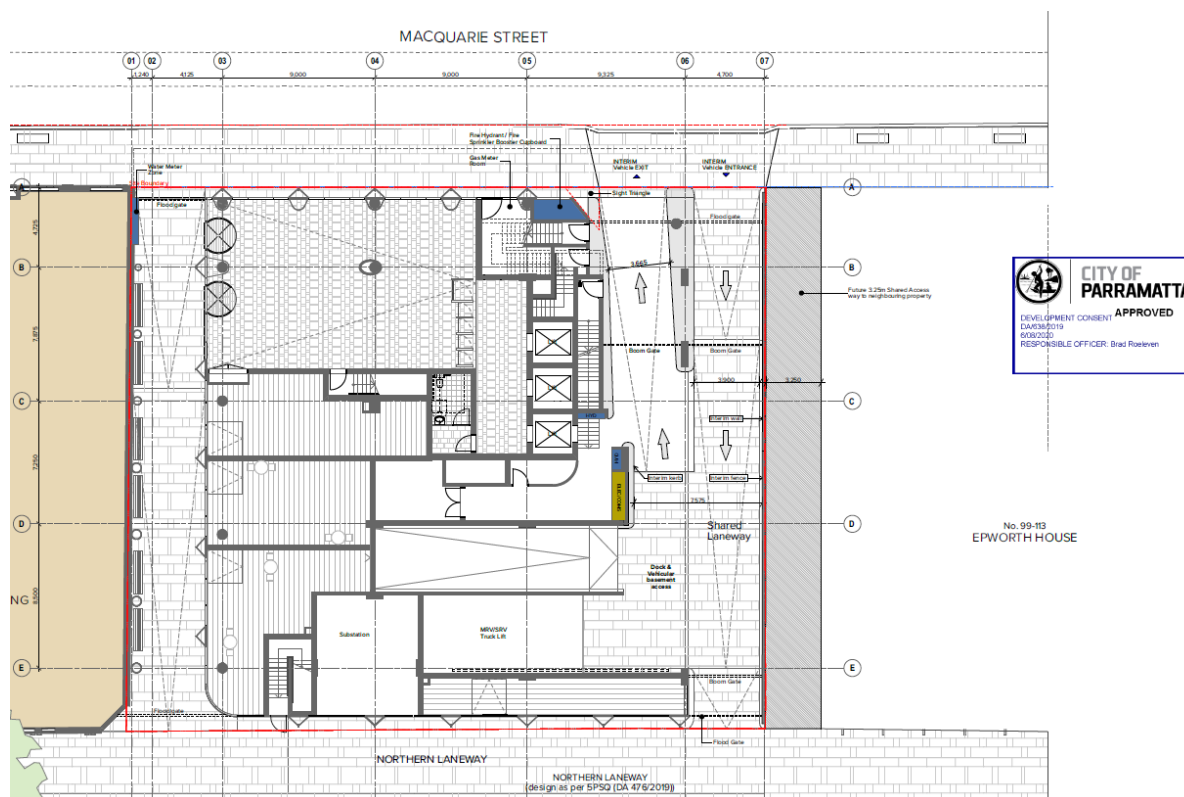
Extract of approved plans for 85-97 Macquarie Street (subject site adjacent to the east)
